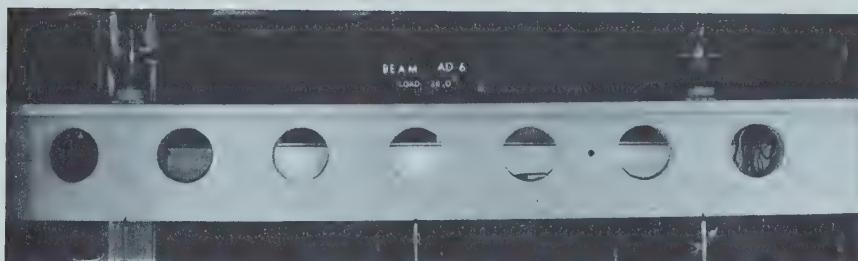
BEAM AD-6 CRACKING AND FAILURE PATTERNS
